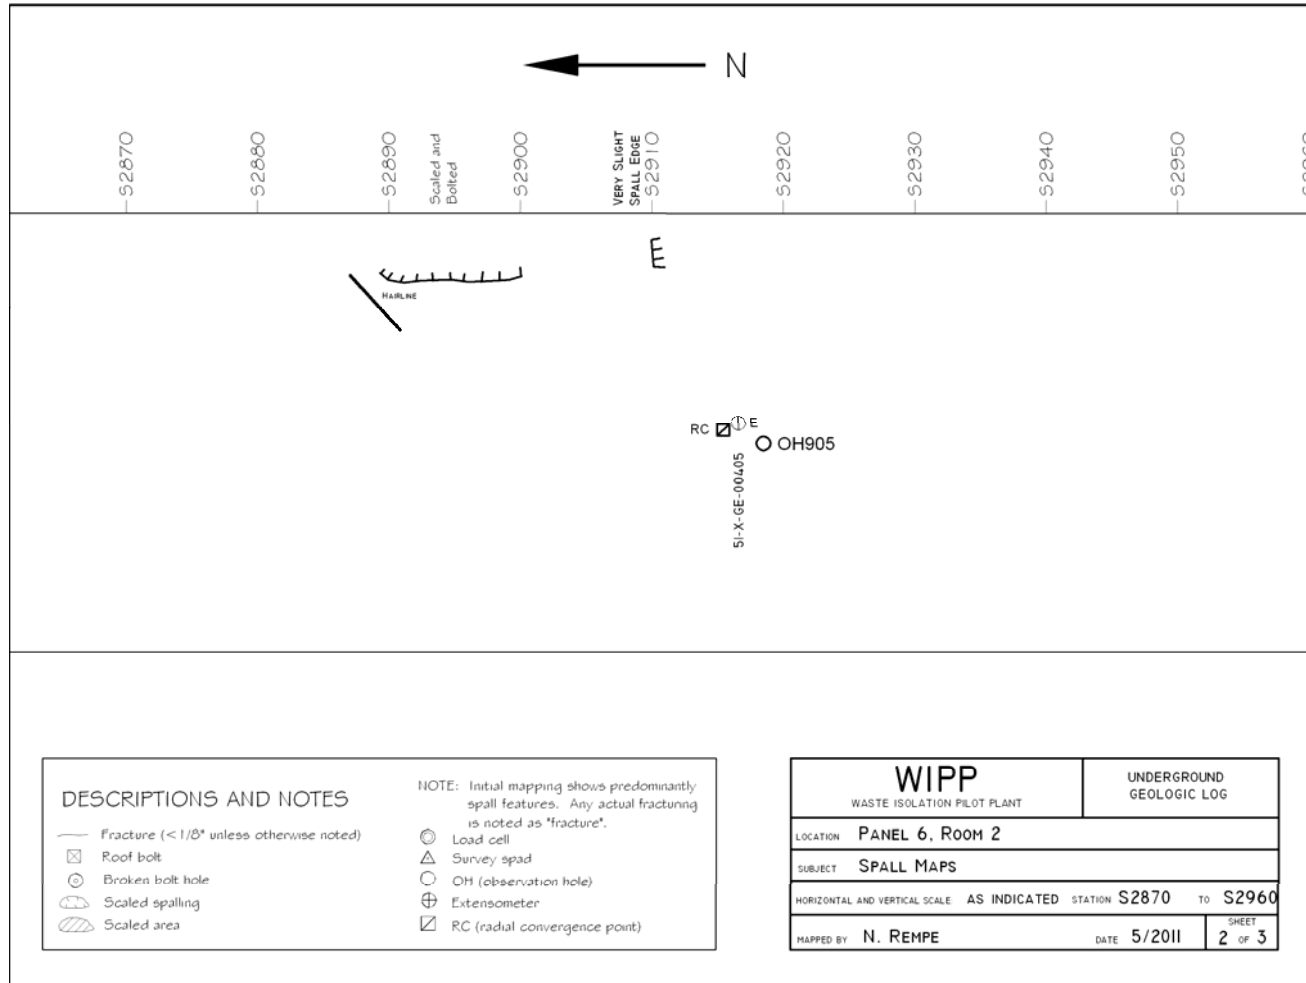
Panel 6 Room 2, S2770-S3060 Roof Fractures (Sheet 2 of 3)
